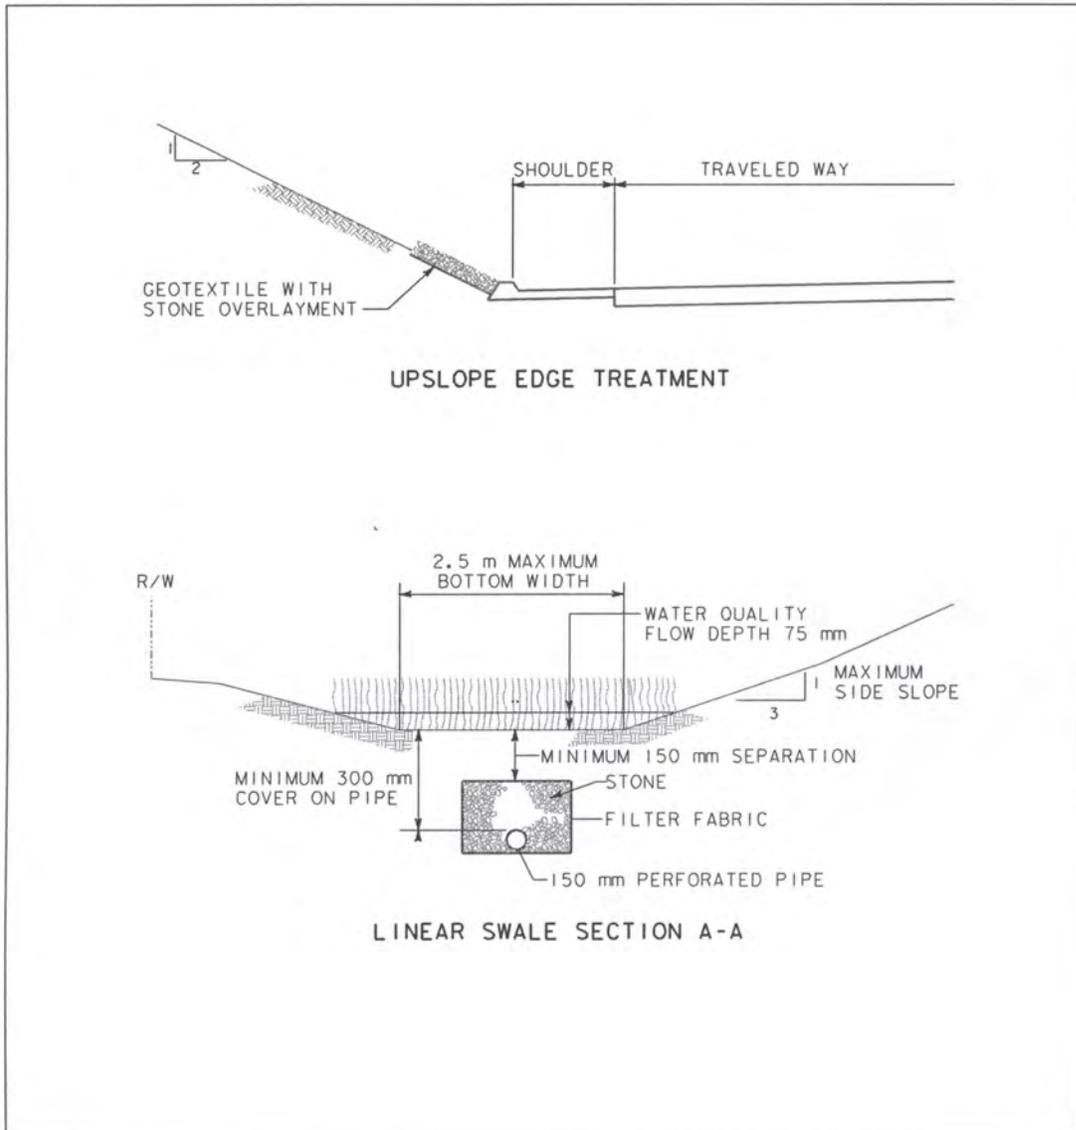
Example #2 - Linear Highway Section Upslope Section and Swale Details
